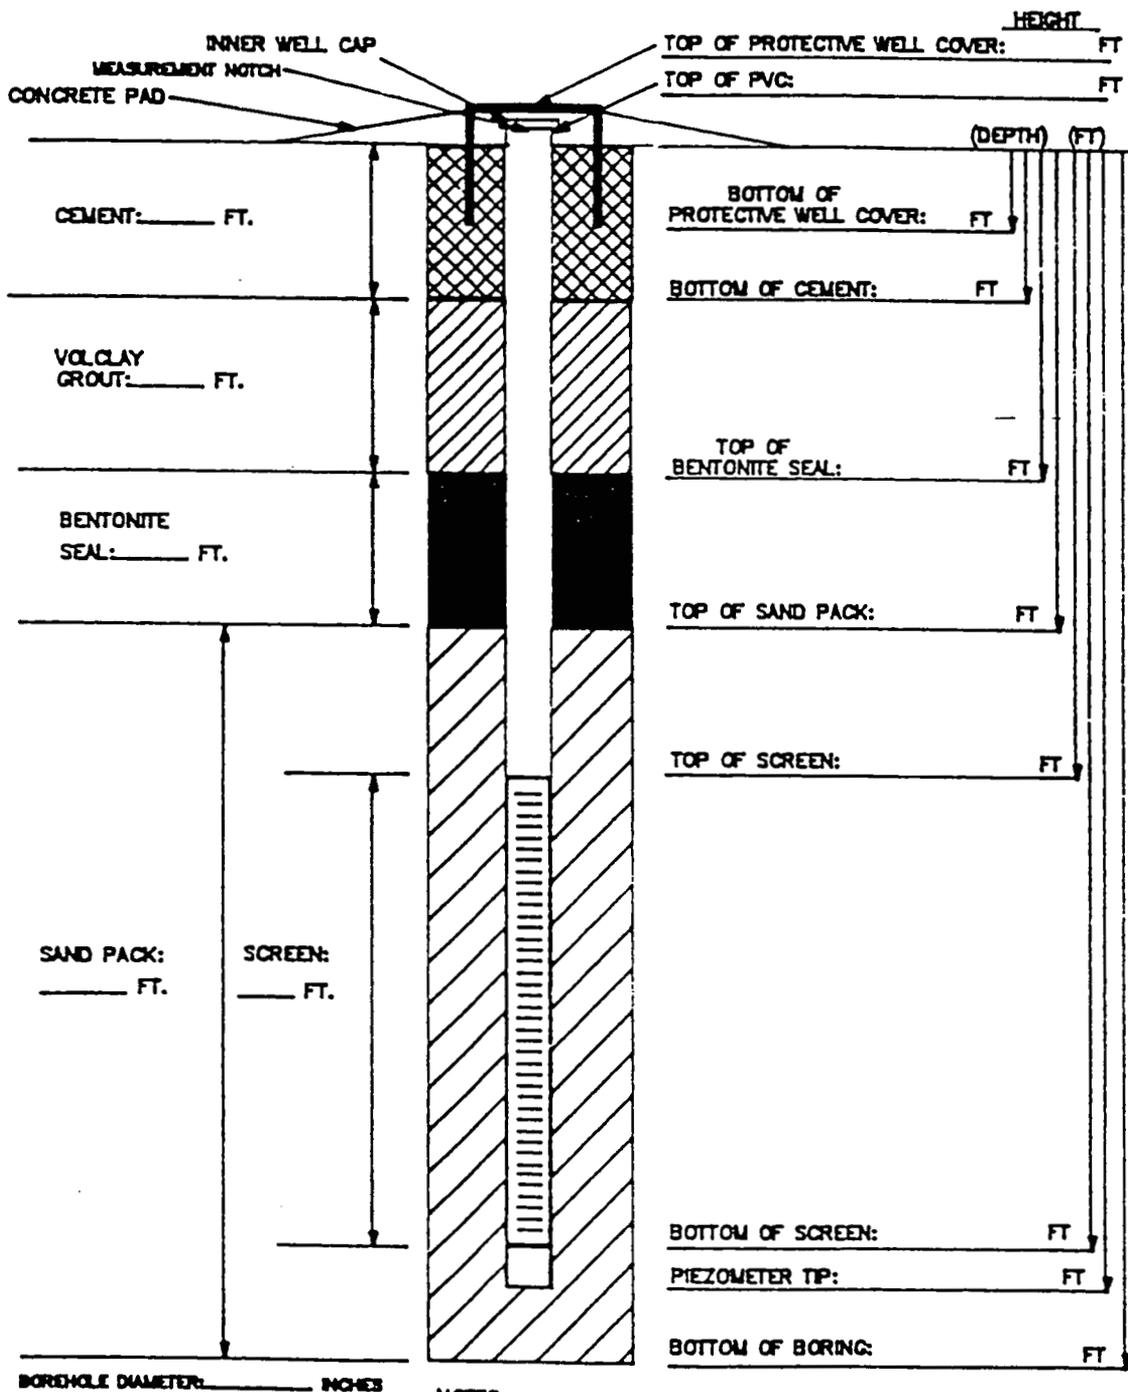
GENERAL INSTALLATION DIAGRAM
